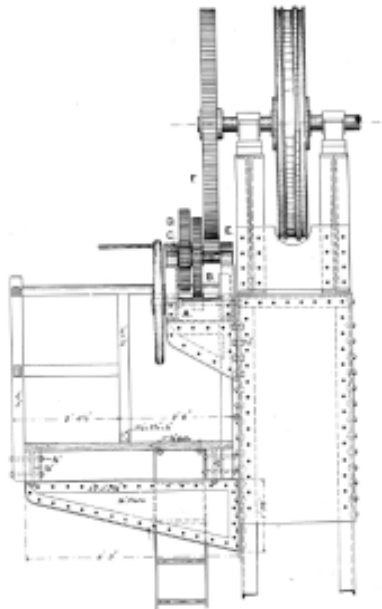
Drawing of winch, gearing and sheaves on Barham Bridge
